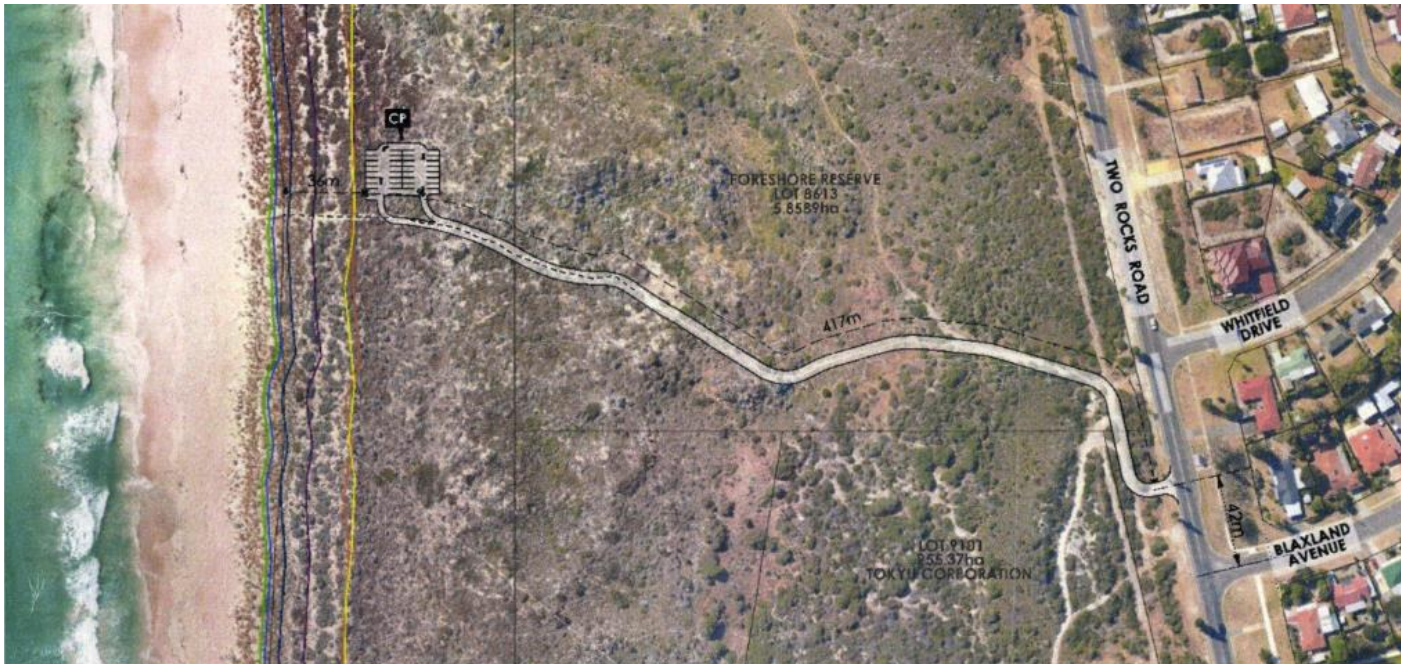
Acumen proposed beach access and carpark concept showing location and orientation from Two Rocks Road to the beach.
